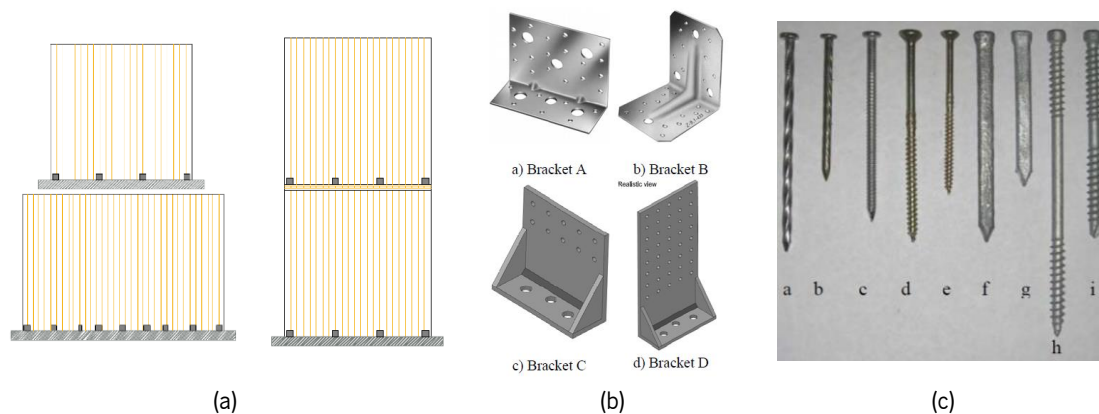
Wall configurations (a), metal brackets (b) and fasteners (c) used on the walls analyzed [32].
